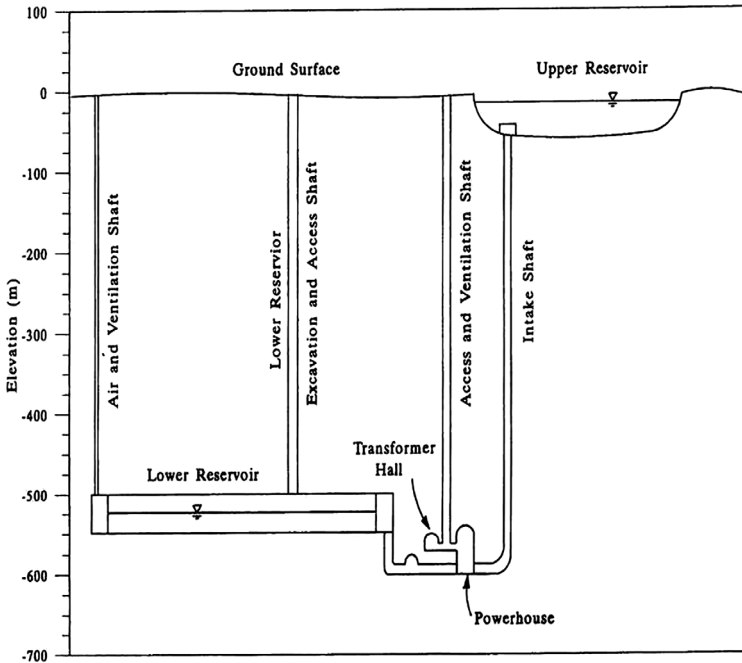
Proposed underground pumped-hydroelectric storage facility layout [7].
